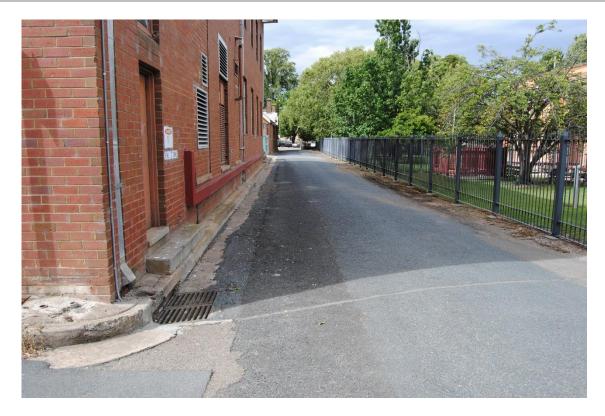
View from the lower northeastern end of Post Office Lane looking toward Montague Street with the existing grated inlet pit located at the entrance to the site in the foreground. A new grated inlet pit is proposed to be installed around the corner on the upslope side of the existing corner pit- in the extreme left hand side of the image.
